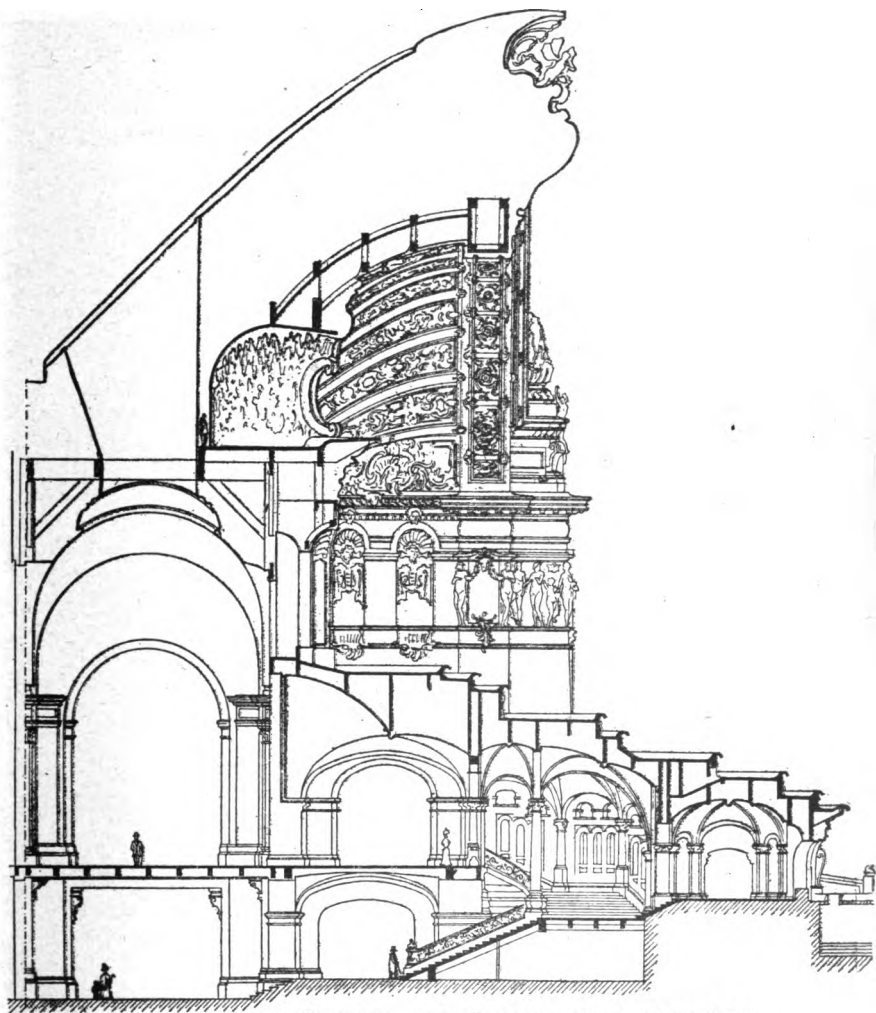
Electric Fountain and Cascade, Paris Exposition, 1900. The most elaborate structure of armored concrete ever erected. 140 feet high.
